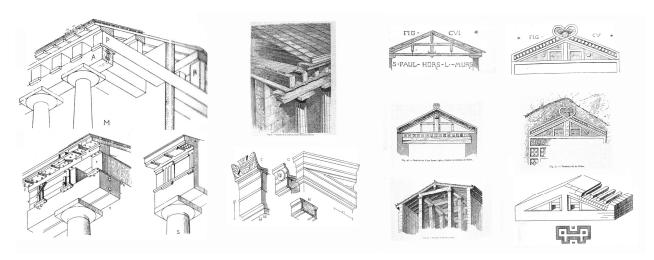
On the left, the Doric temple as a petrification of a "coffrage" in wood (Choisy, 1899, pp.280, 288, 286) compared to Dieulafoy 1884 version (p.65). On the right, from top to bottom: opposed lectures of wood roofing from Midas tomb (Chipiez 1876, p. 216, and Dieulafoy 1884, p.58), and its interpretation in Choisy (1899, p. 253) compared to Pireo's restitution in Dieulafoy (Id., p.60)
